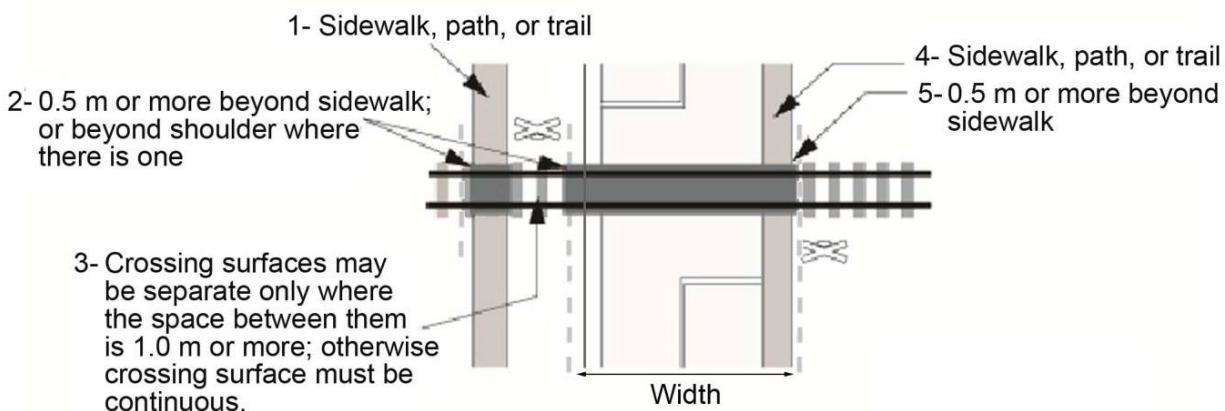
(b) – Crossing Surface Dimensions for sidewalks
